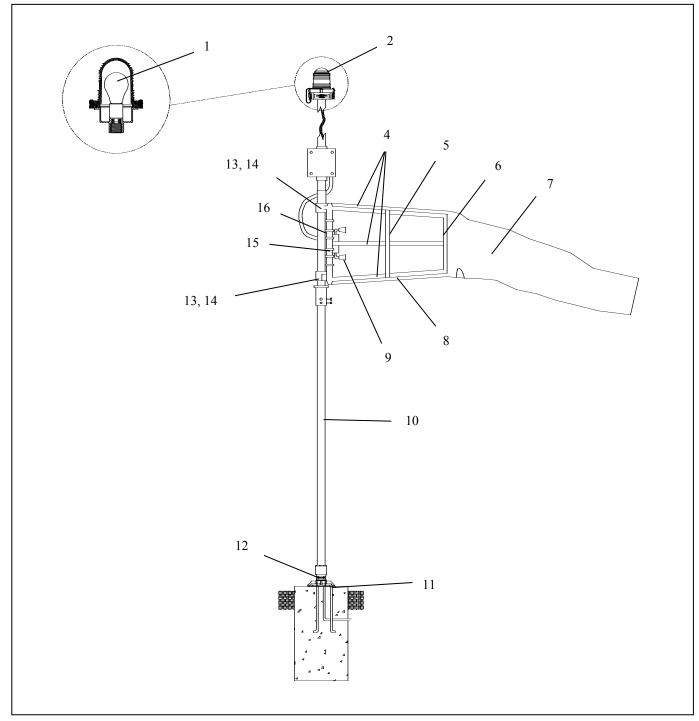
L-806 Wind Cone (With Internal Lighting Assembly)
